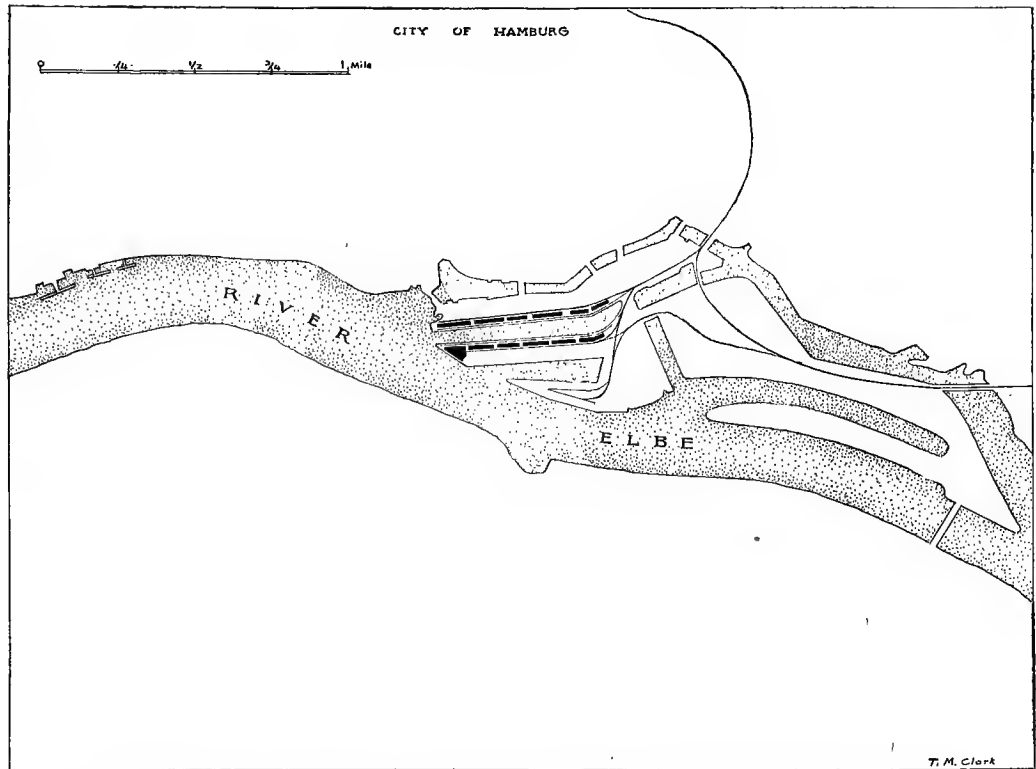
Plan of Site of New Harbor of Hamburg. Before Improvement.
